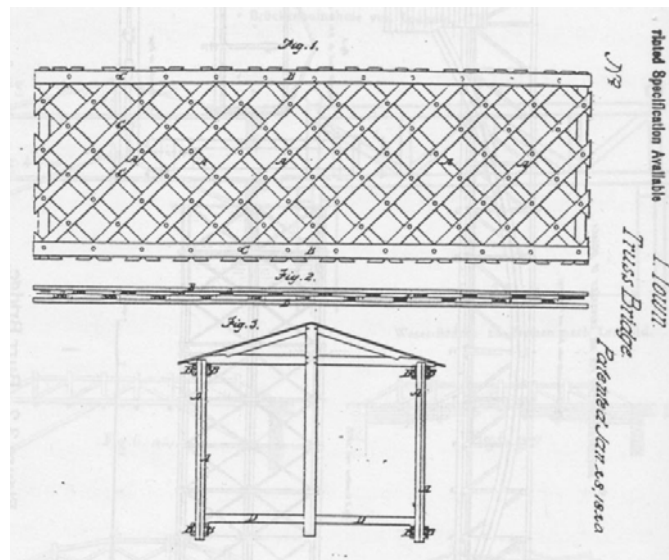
Drawings from Town's first patent (Dreicer 1993)
